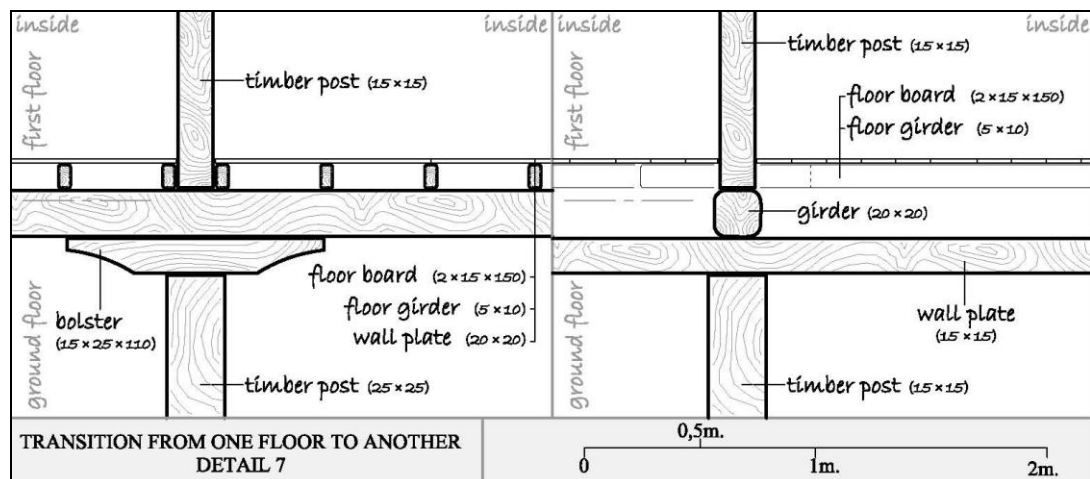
, Detail of use of timber posts in both floors; placement of the upper floor timber post on the lower floor timber post wall plate (left), placement of the upper floor timber post on girder (right)
